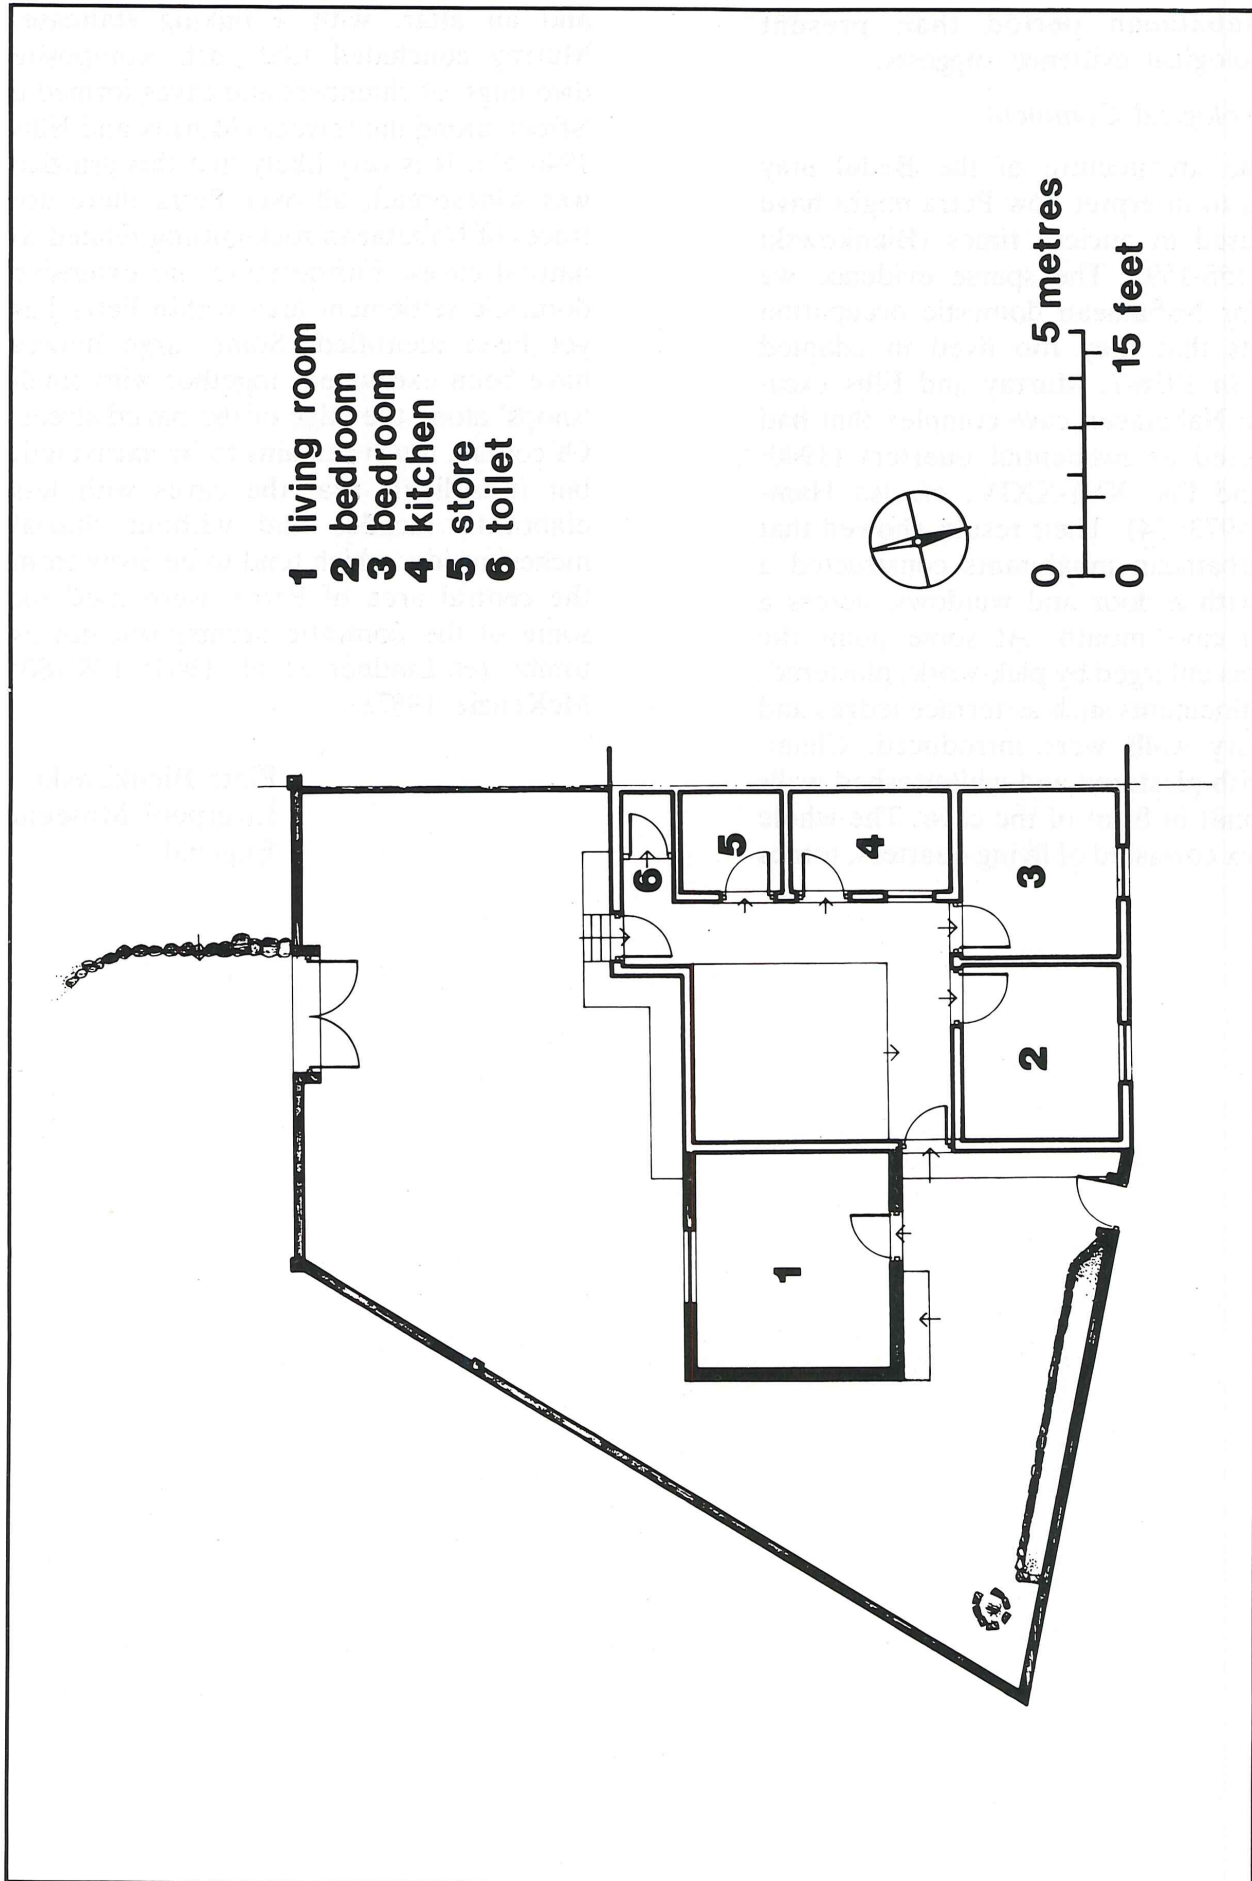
Plan of family house in Umm Saihun. Shaded walls indicate structures added by the Bedul to the basic unit.
